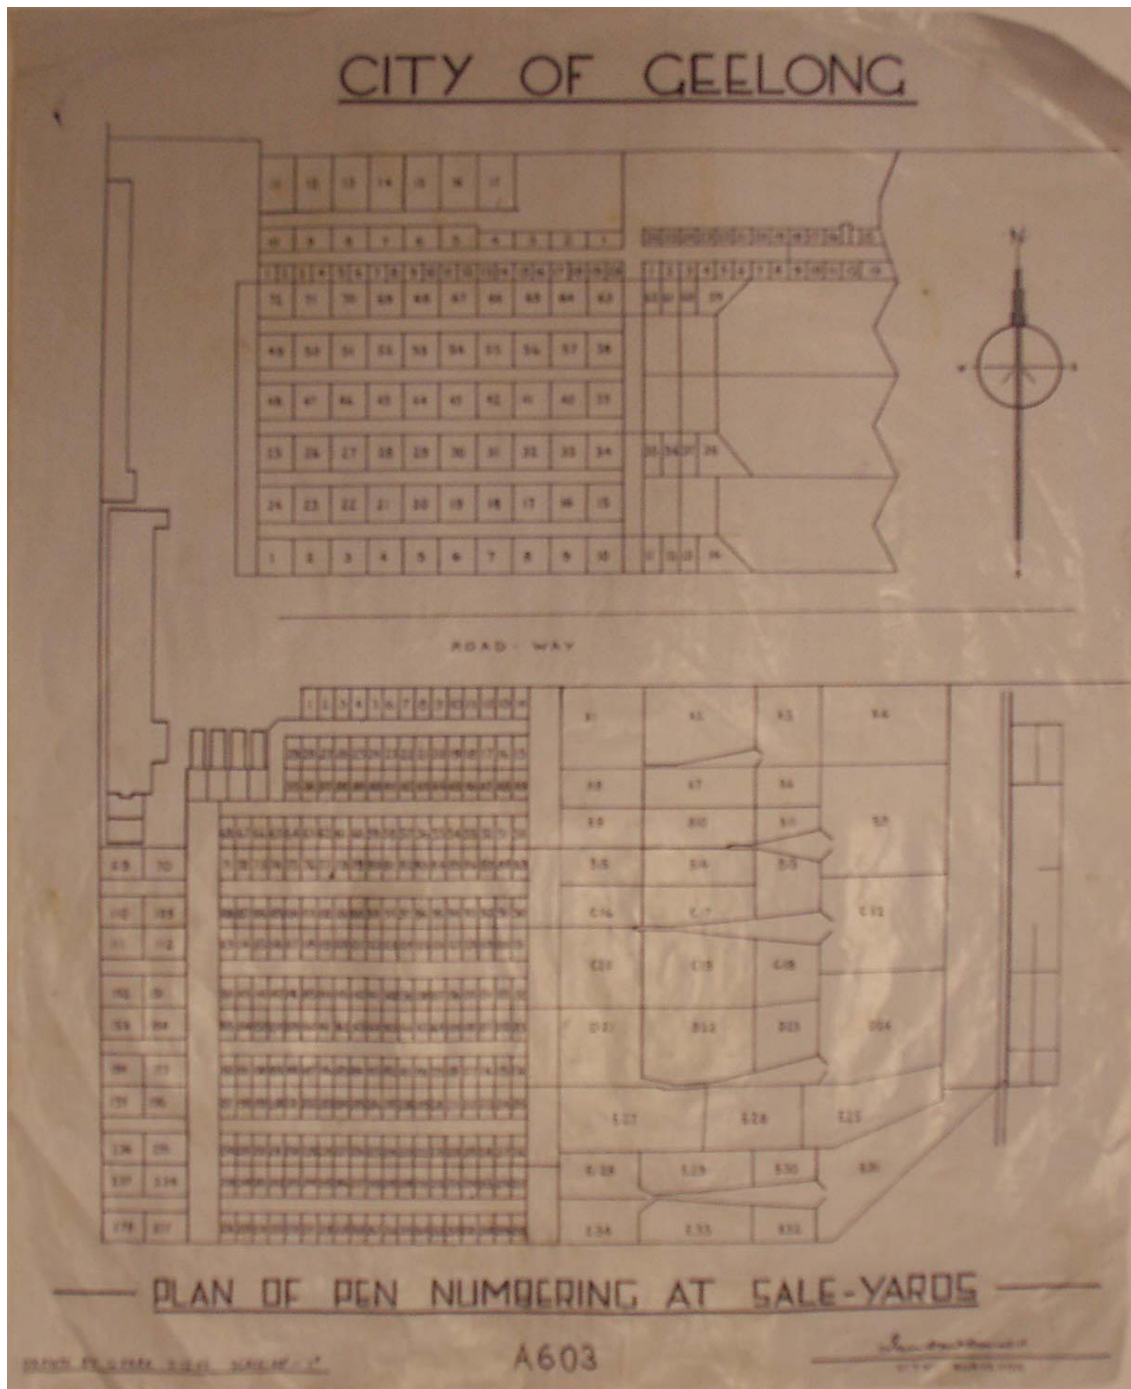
Plan of Pen-Numbering at the Geelong Sale Yards, 11 December 1942. Source: Geelong Council Plans collection, A603, Geelong Heritage Centre.
